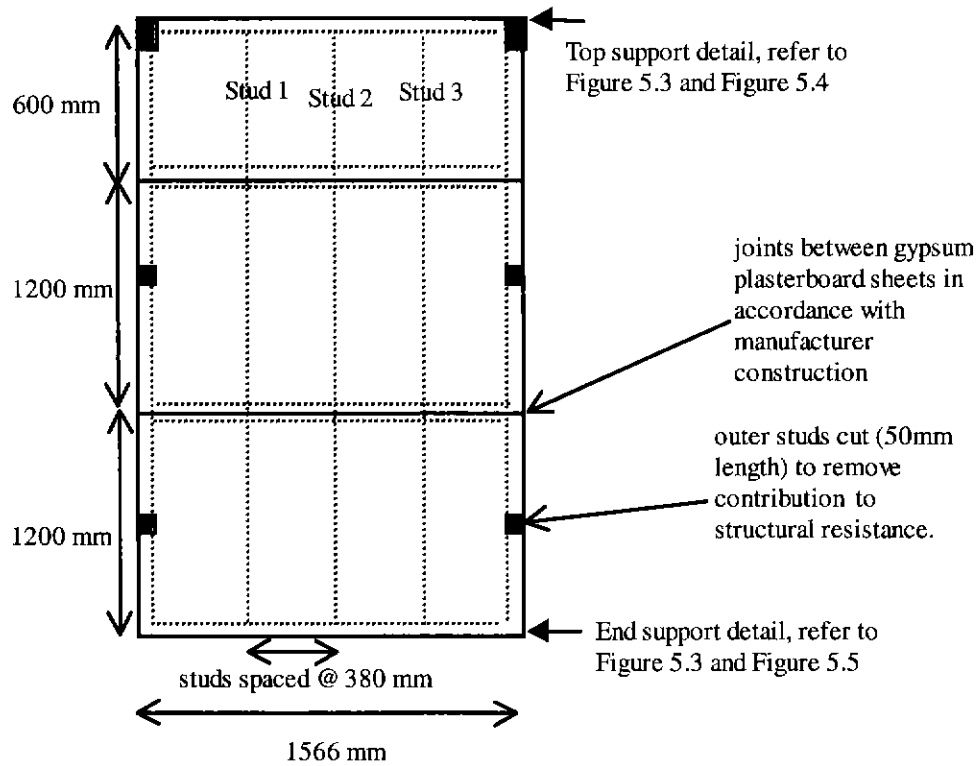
Elevation of Typical Sheeted Wall Panel Construction Detail
